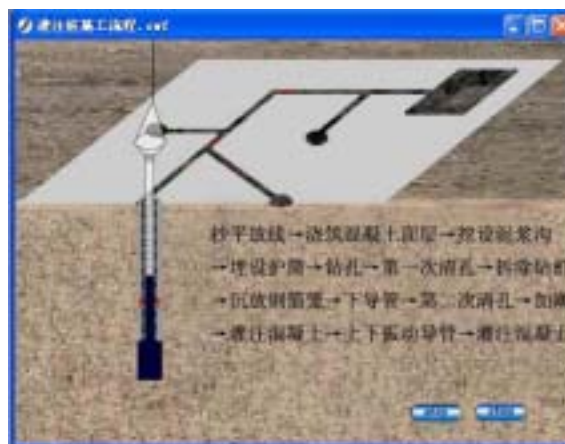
The fourteenth step of bored pile construction technique is to pour concrete.
